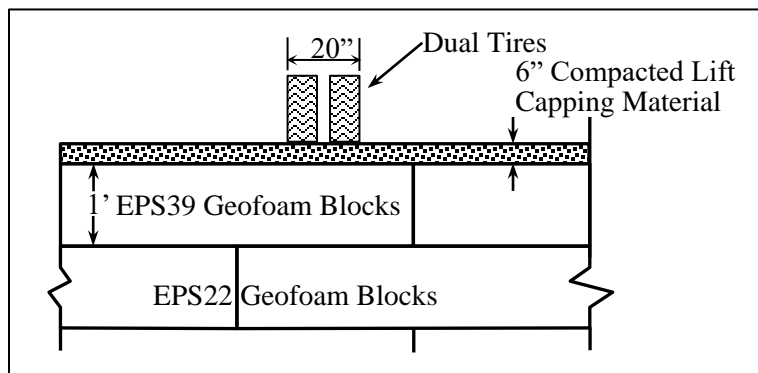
Typical Geofoam Embankment with 1 foot EPS39 Geofoam
